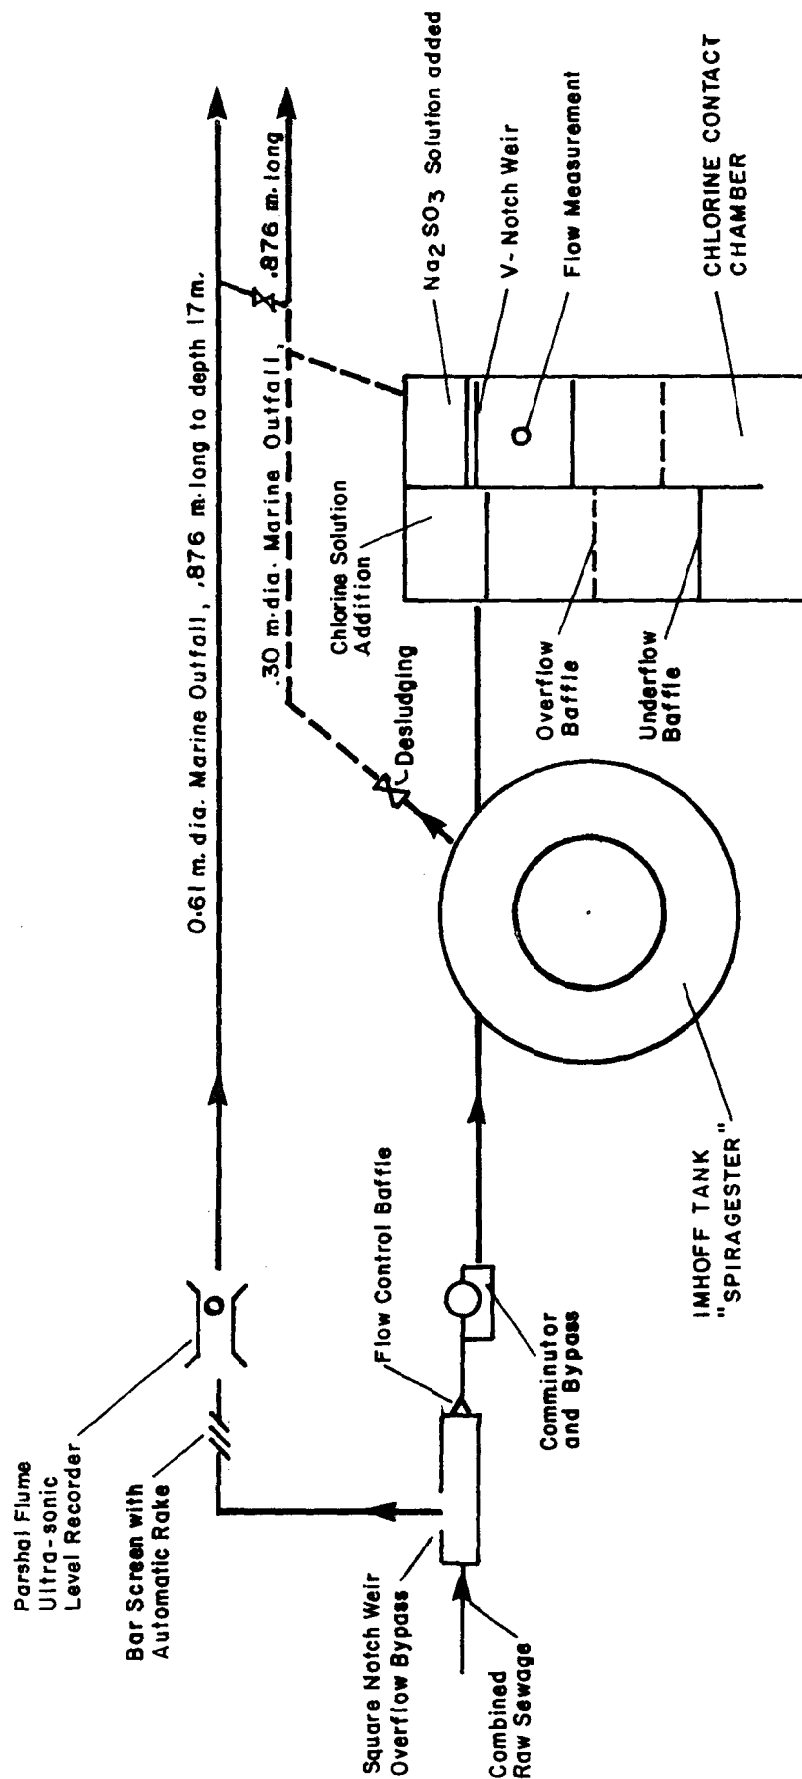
LADYSMITH SEWAGE TREATMENT PLANT LAYOUT
